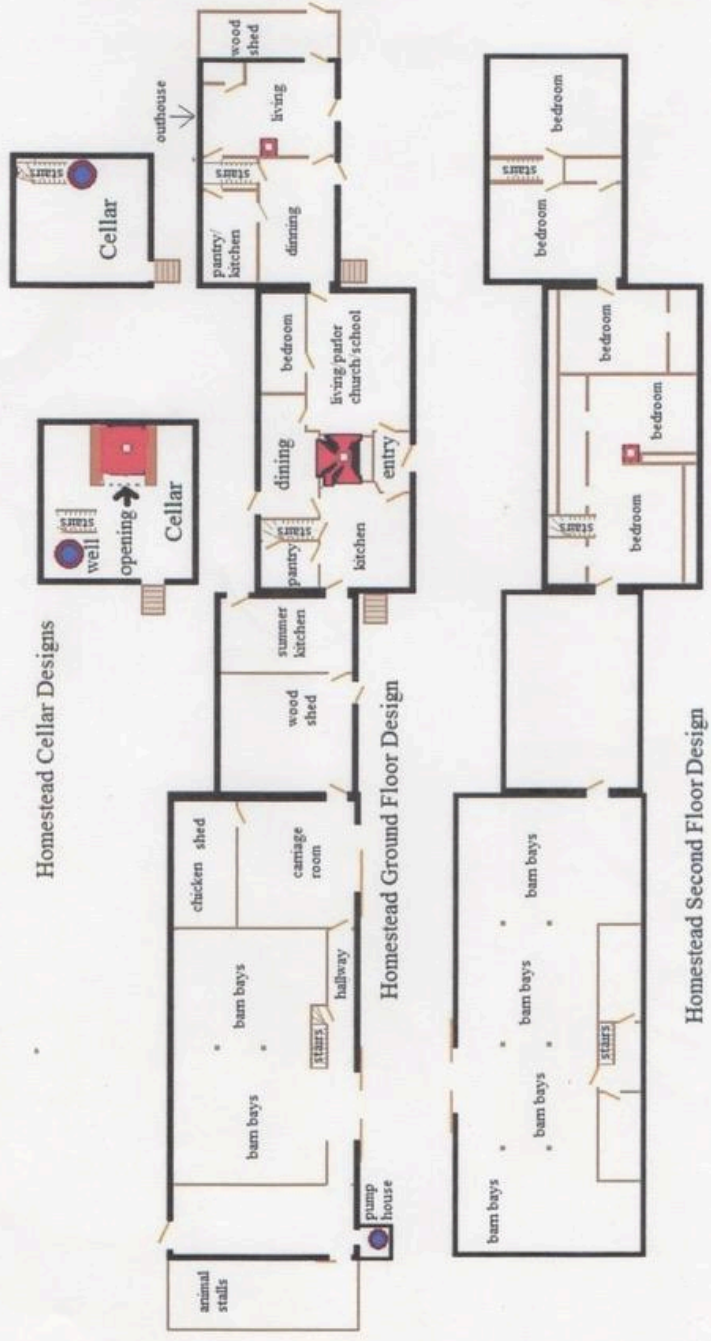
The Hinkley farm (Nathan D. Wing) floor plan, with notes on family occupancy.
